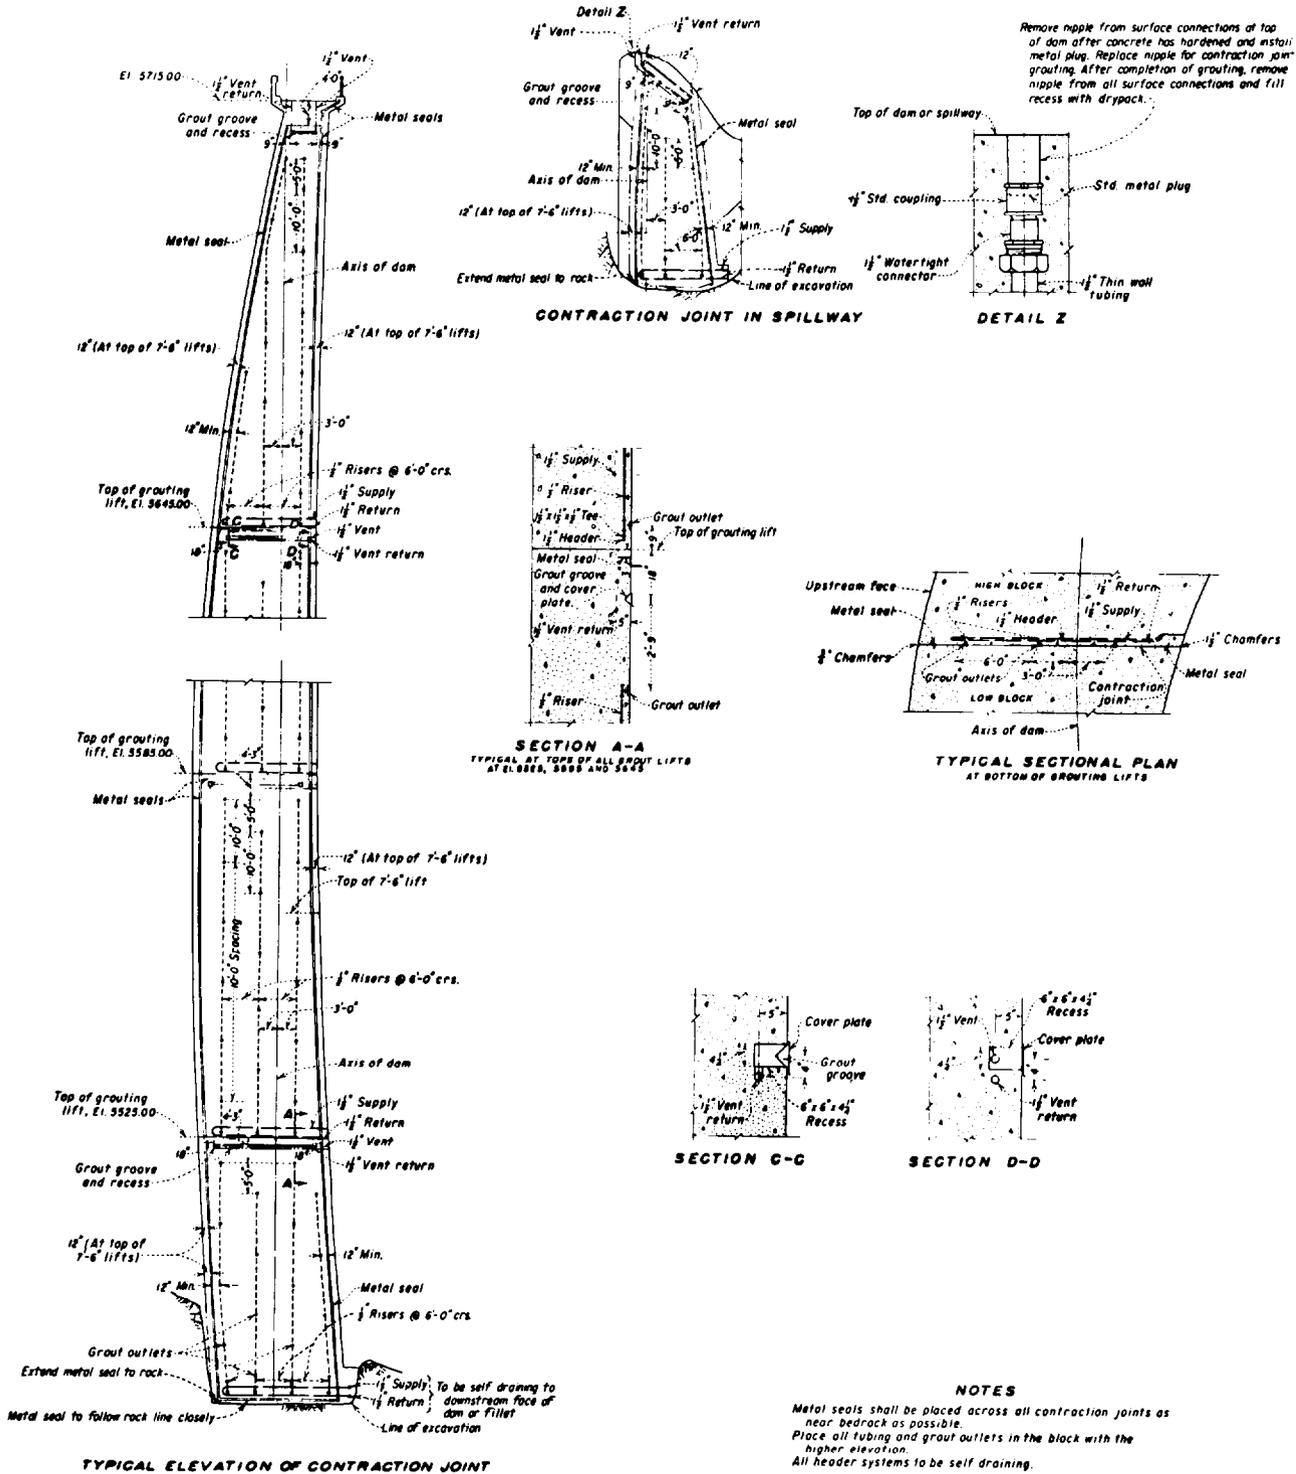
Transverse contraction joint and grouting system for East Canyon Dam, a small arch dam in Utah.—288-D-3029
